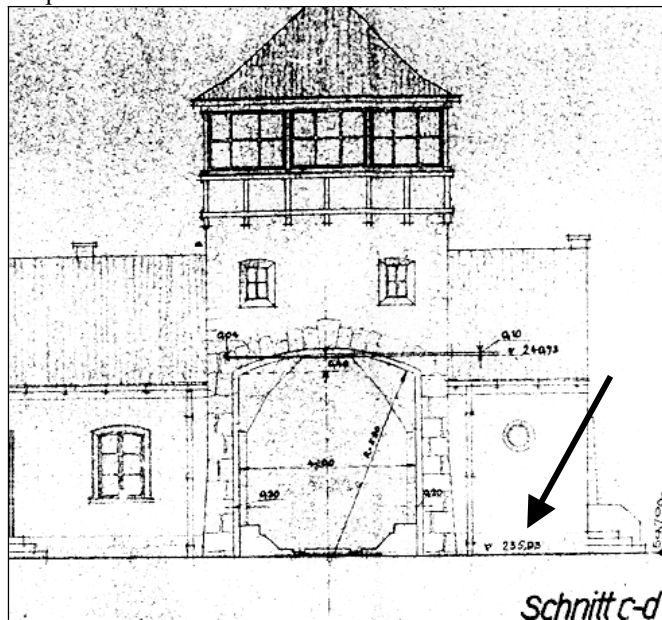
Detail enlargement of the building plan of the main police station of the POW camp Auschwitz-Birkenau. The elevation of the construction site above sea level is clearly marked (arrow). This plan was obtained from the Moscow Central Archives, and without an archival reference number, which we are endeavoring to obtain.
